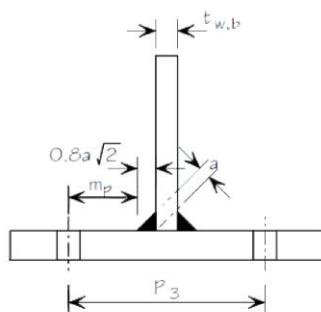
Plan view of details for end plate. Retrieved from “Steel Building Design: Worked examples for students in accordance with Eurocodes and the UK National Annexes” by The Steel Construction Institute (p. 87), 2009.
